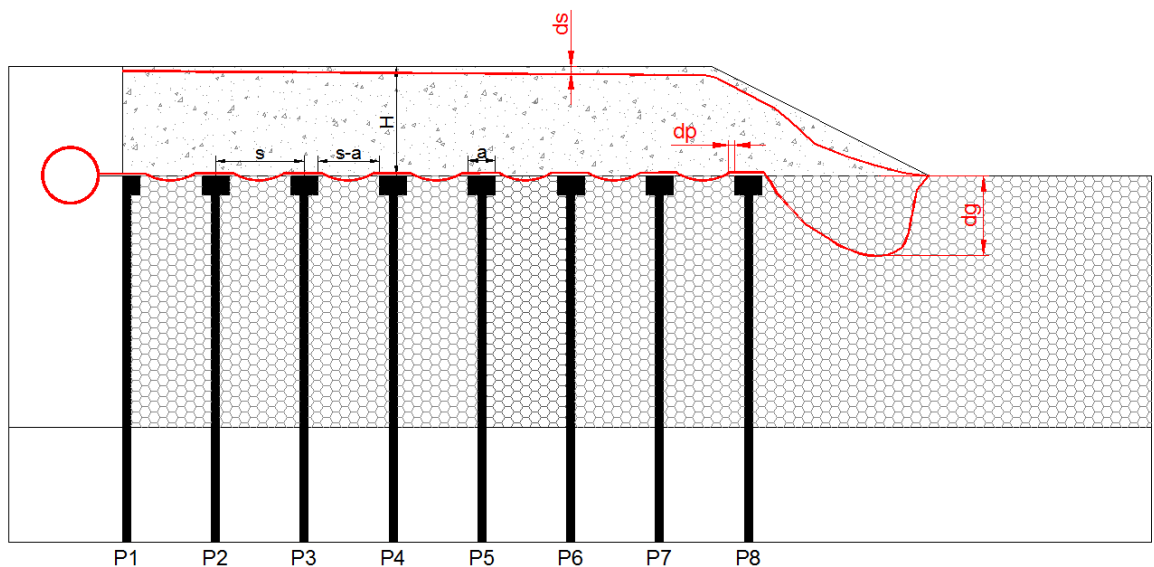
Typical pile group lateral deformation, geosynthetic reinforcement and embankment surface deformation profile (Piles are labelled to P1 to P7)
